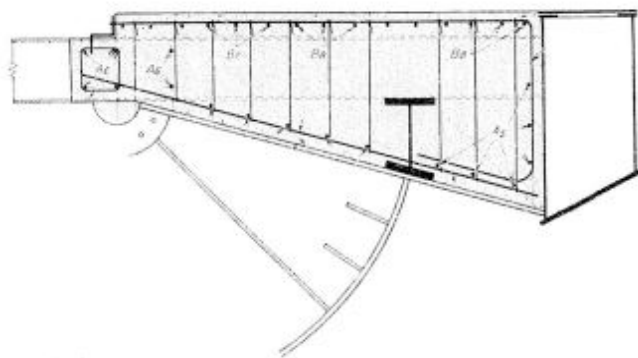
Swansea Bridge single leaf elevation and Cross Section
